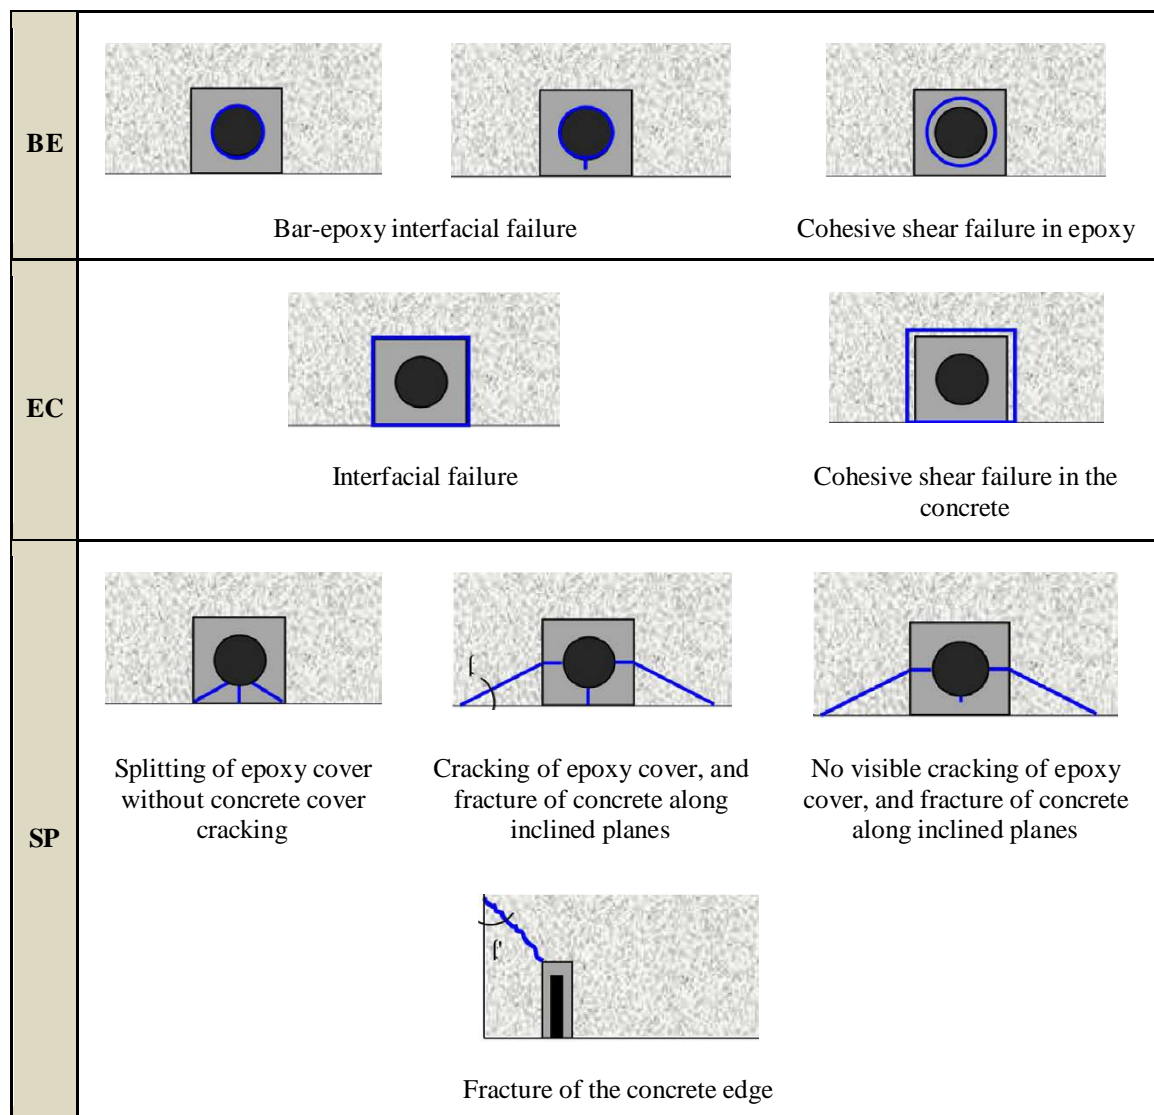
Failure modes observed in bond tests on NSM-FRP systems (BE: bar-epoxy interface failure, EC: epoxy-concrete interface failure, SP: failure associated to the splitting of the epoxy cover and/or fracture of its surrounding concrete in the inclined planes) [54]
